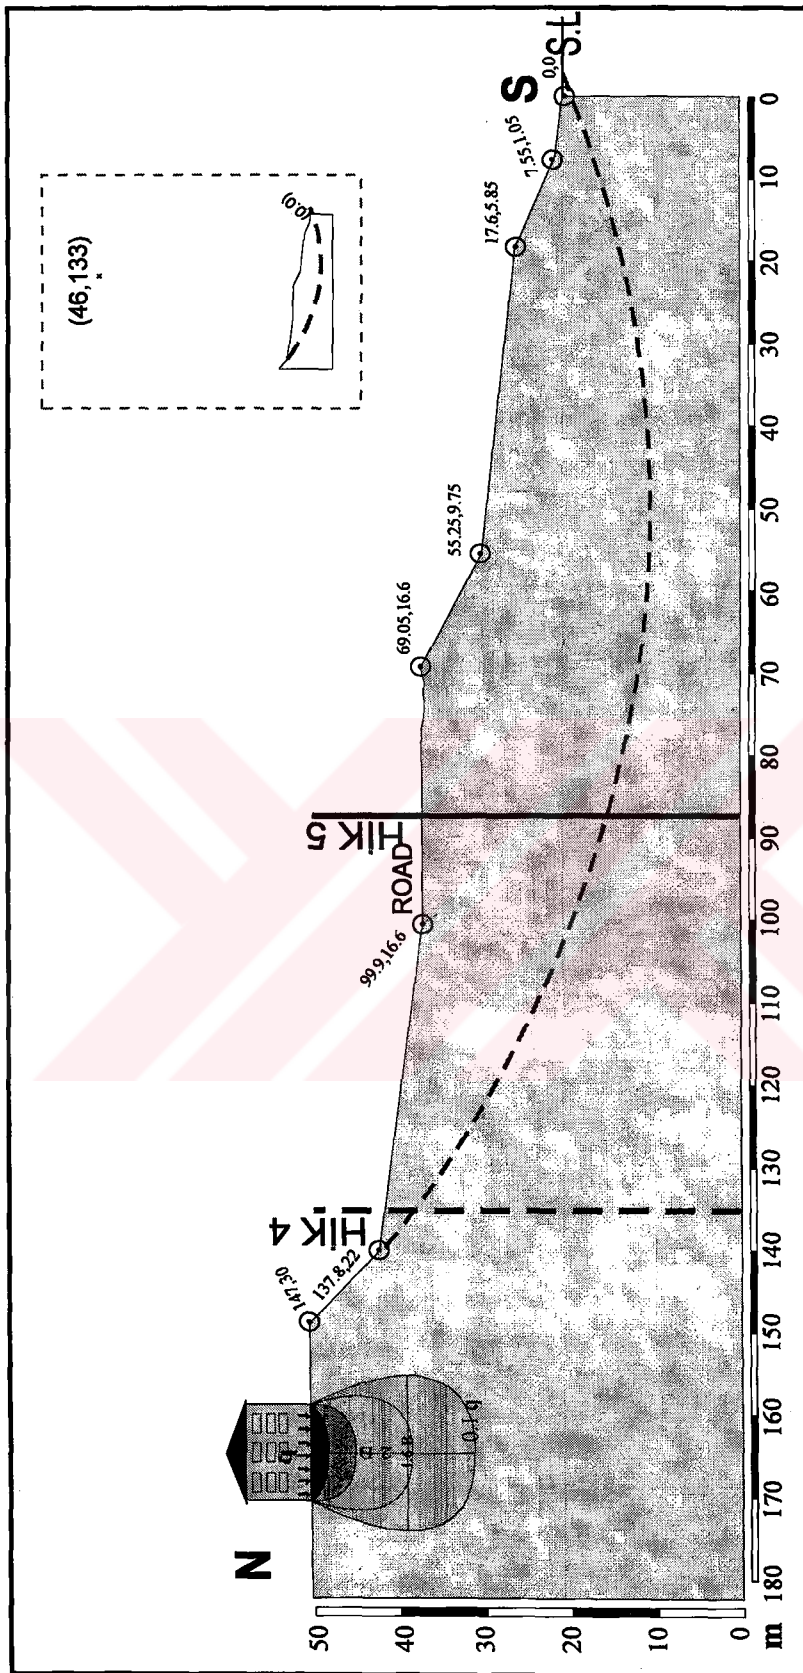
Pressure exerted by the building behind scarp 1 on cross - section 1.
